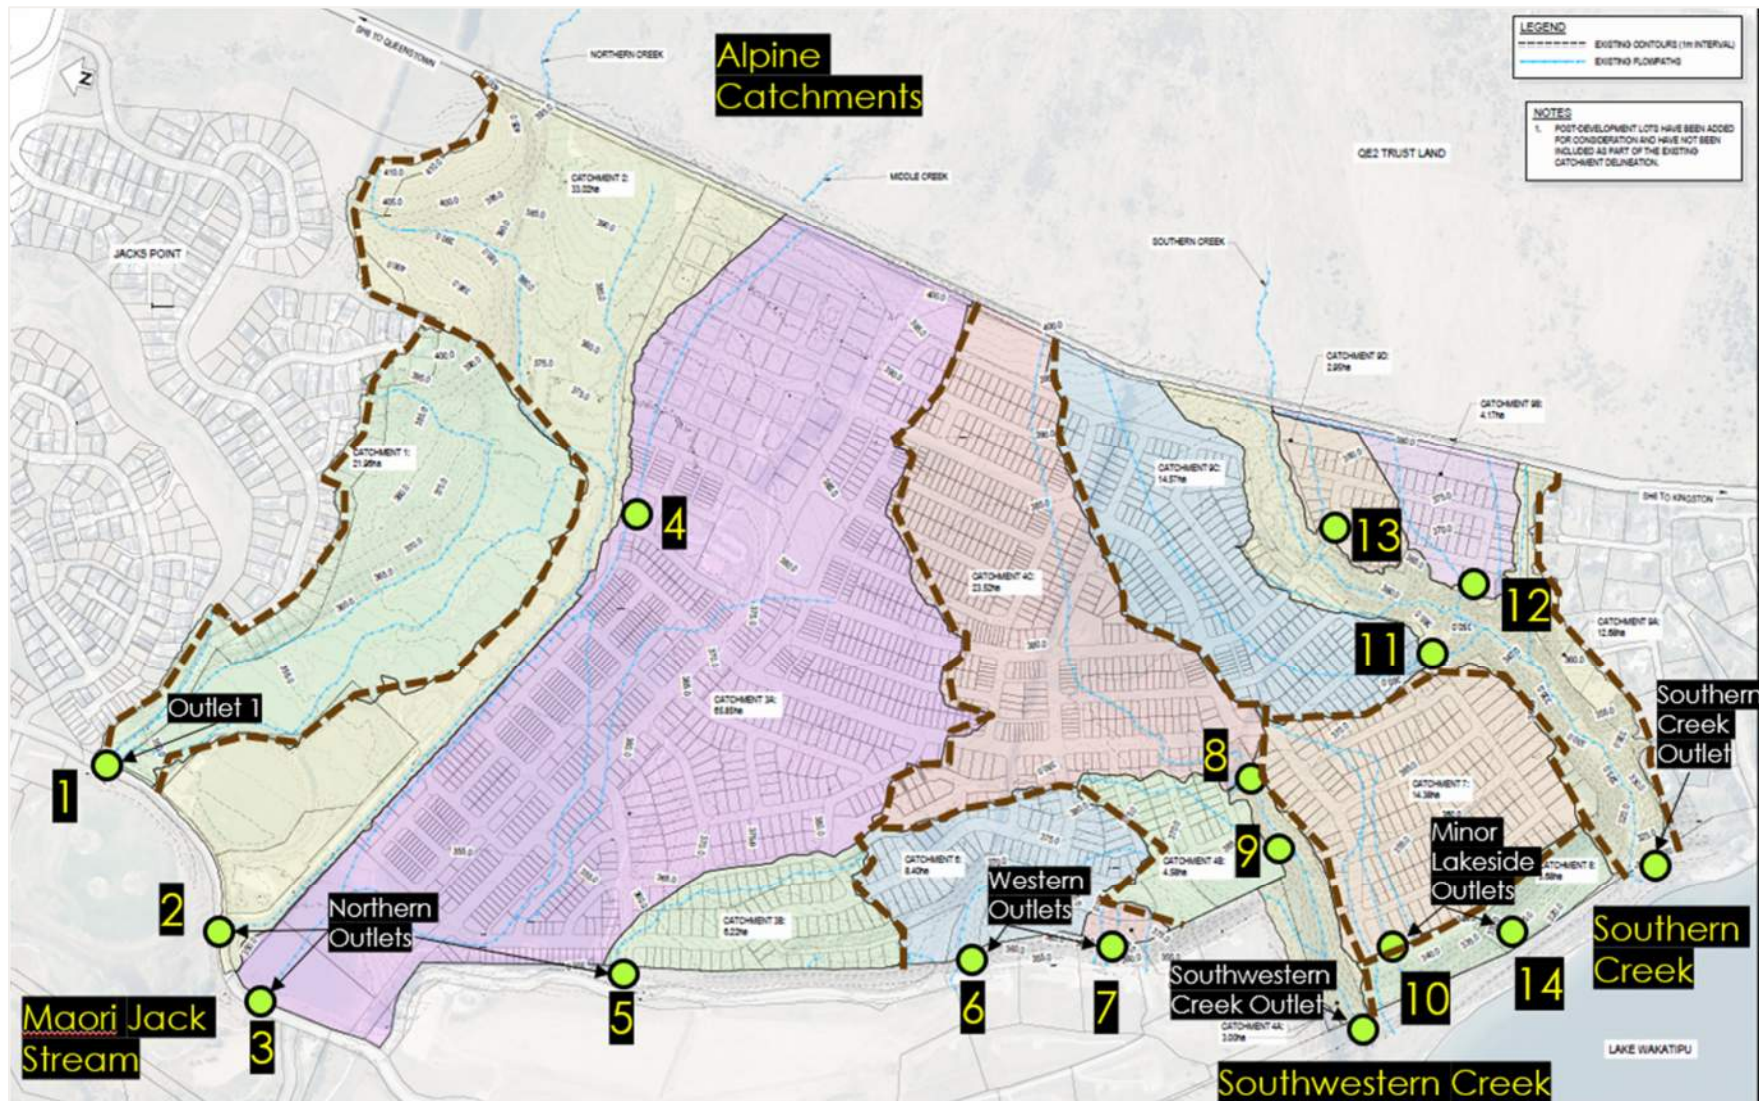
Homestead Bay - Pre-development Runoff Catchment Plan with numbered outlets with proposed development layout shown for context
